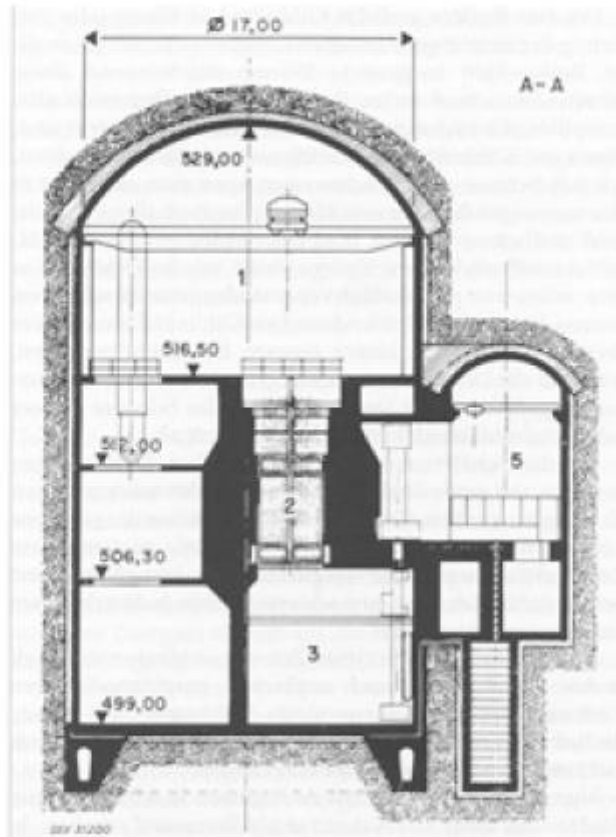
Lucernes' Cross section (Source: Duffaut P., 2007).
